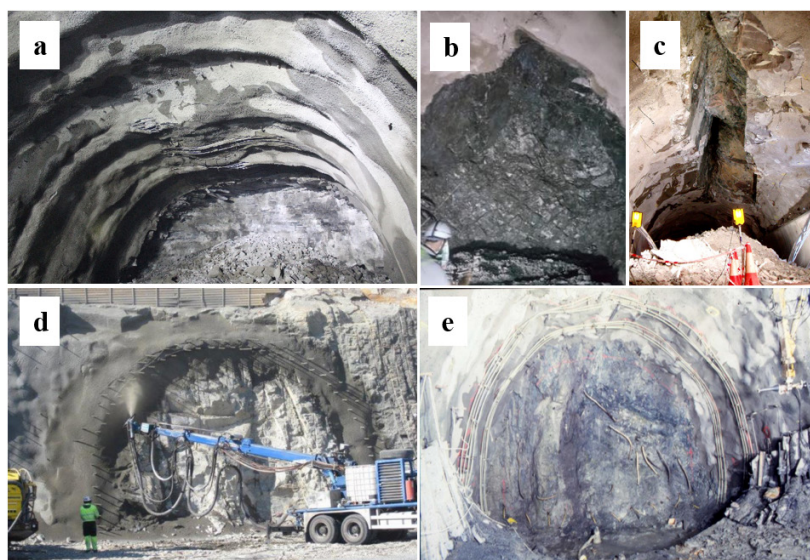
Ground behavior types in hard rock tunnels. a) geological structure-controlled roof delamination (Photo: Skanska), b) stress-induced and structurally controlled overbreak in fractured rock, c) weakness zone failure, d) very low in-situ stresses e) weak rock in fault zone (Photo: K.G. Holter).
